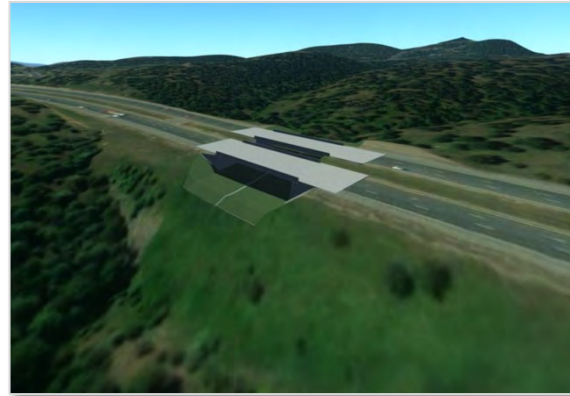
Concept for bridge underpass at MP 250 Ruby Ranch Road
